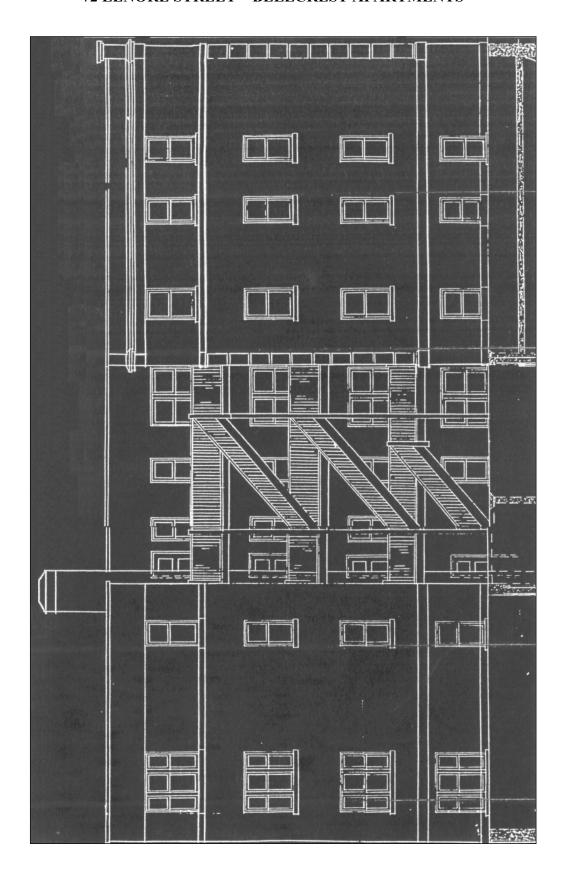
Plans for the north elevation of the "Biltwell" (Bellcrest) Apartments, 72 Lenore Street. (Reproduced from Plans 2973/1928, held at the City of Winnipeg Archives, William Avenue.)
